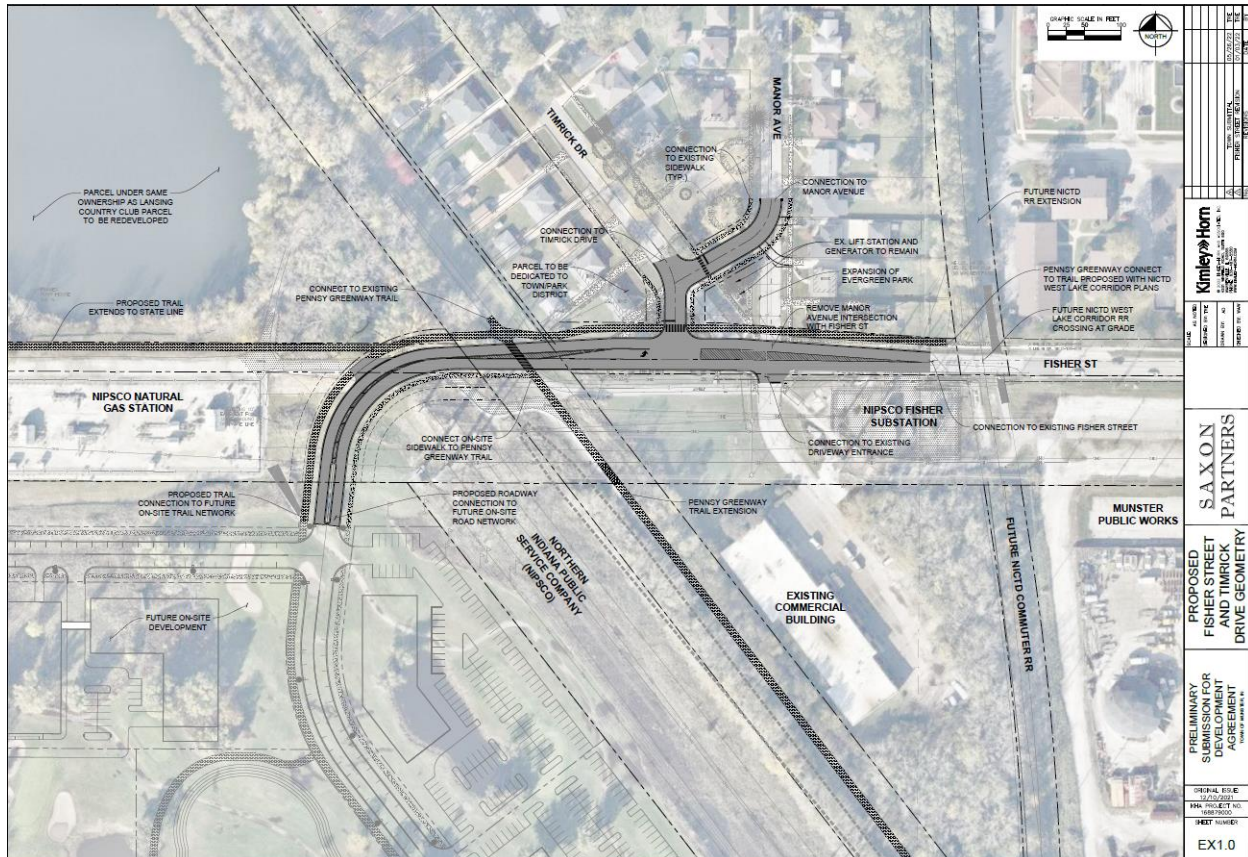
Proposed extension of Fisher Street and reconfiguration of Timrick Drive, Manor Avenue, and Evergreen Park
